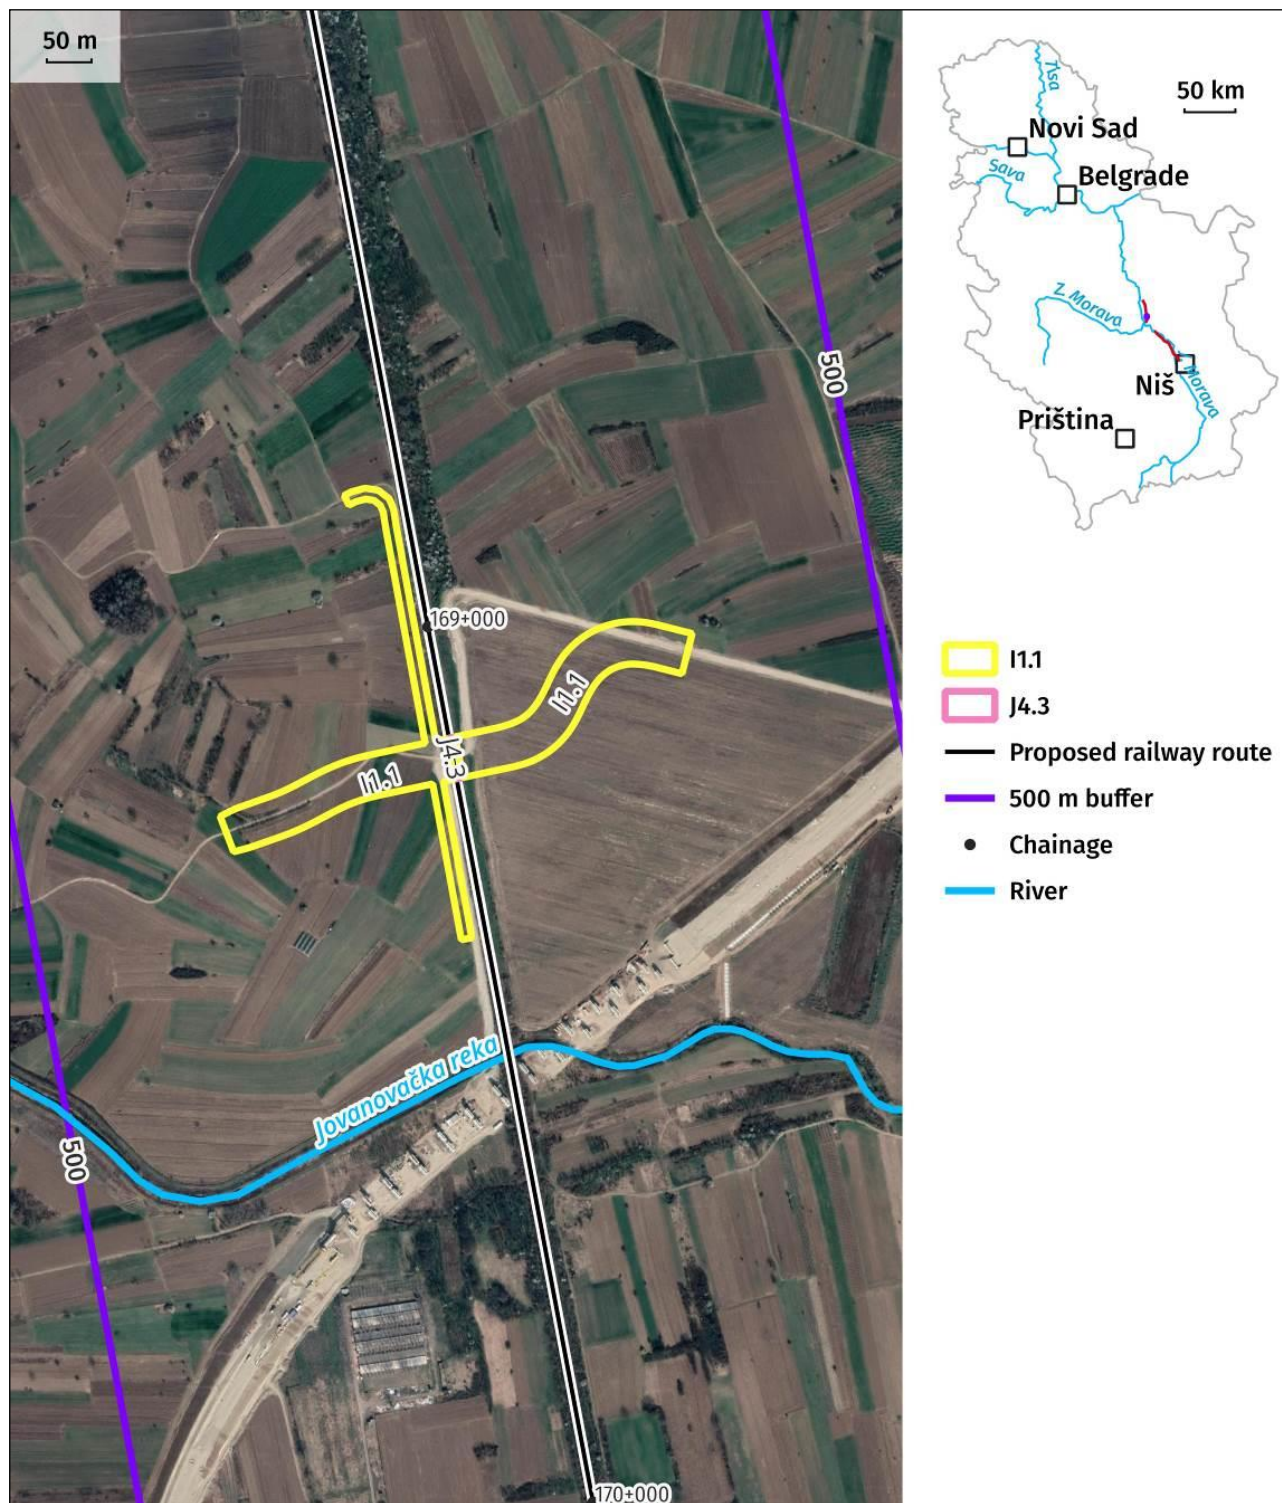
A crossing and access road at 169+151 km – Paraćin-Stalać subsection
